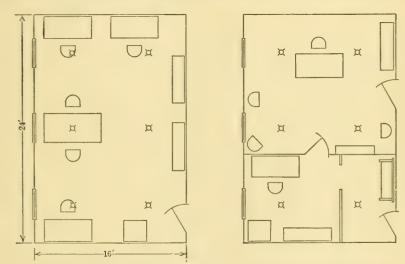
Location of Outlets Should Provide for Possible Changes in Office Arrangement.
